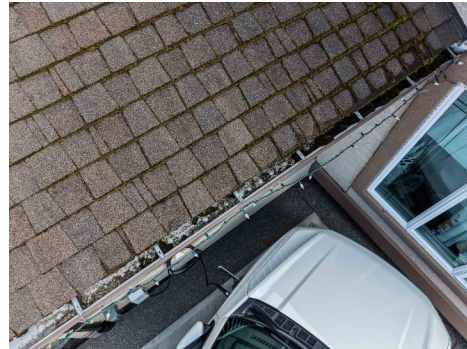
Detail 6 — Drainage / Gutters and Downspouts, North.
